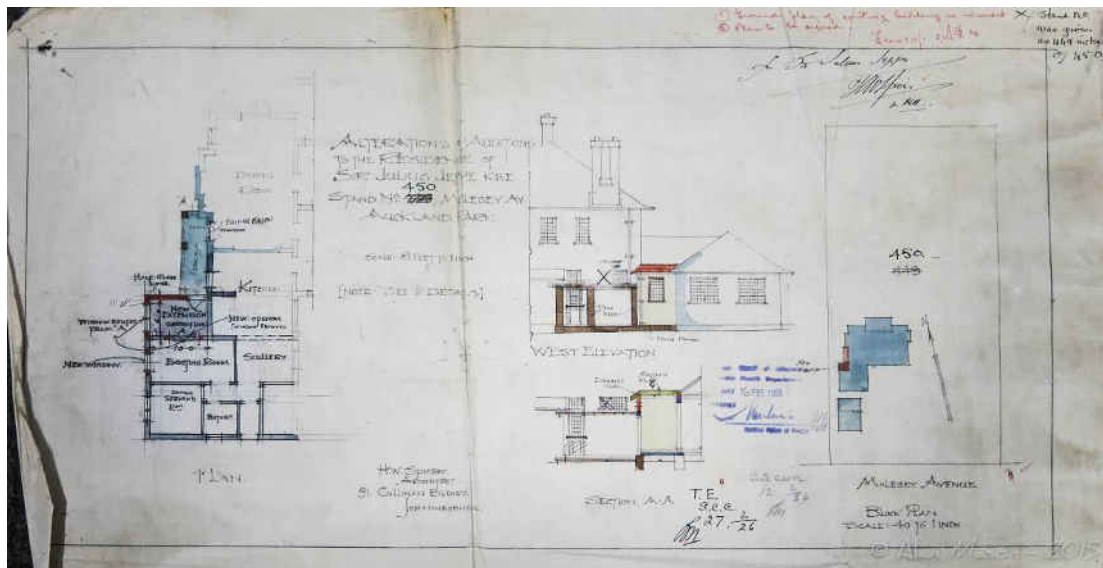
Alteration and addition plan for residence on Stand 450 along the western elevation of the building structure
